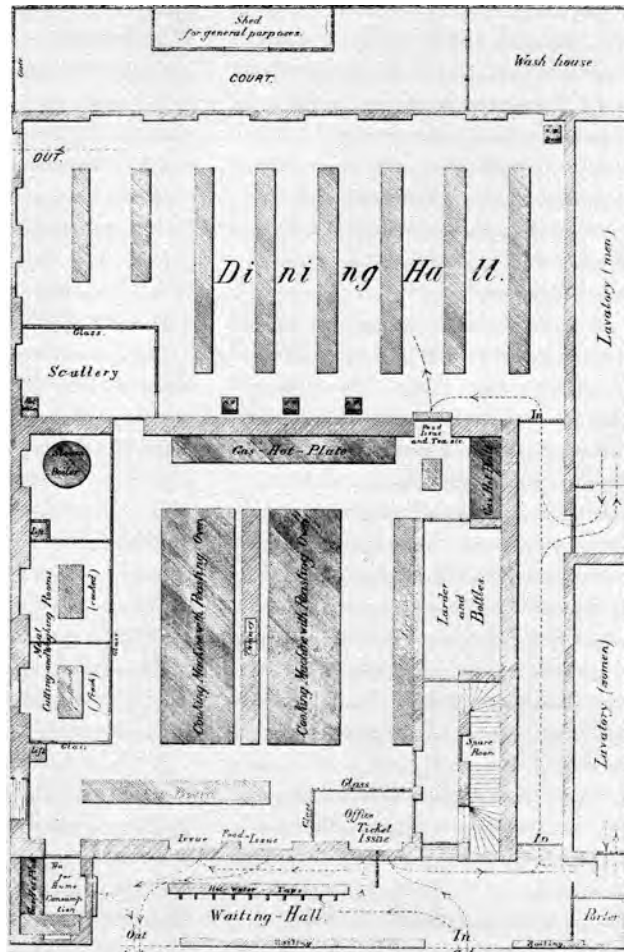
M. P. Wolff's Plan for a Public Kitchen, 1884 (Hayden, 163).
